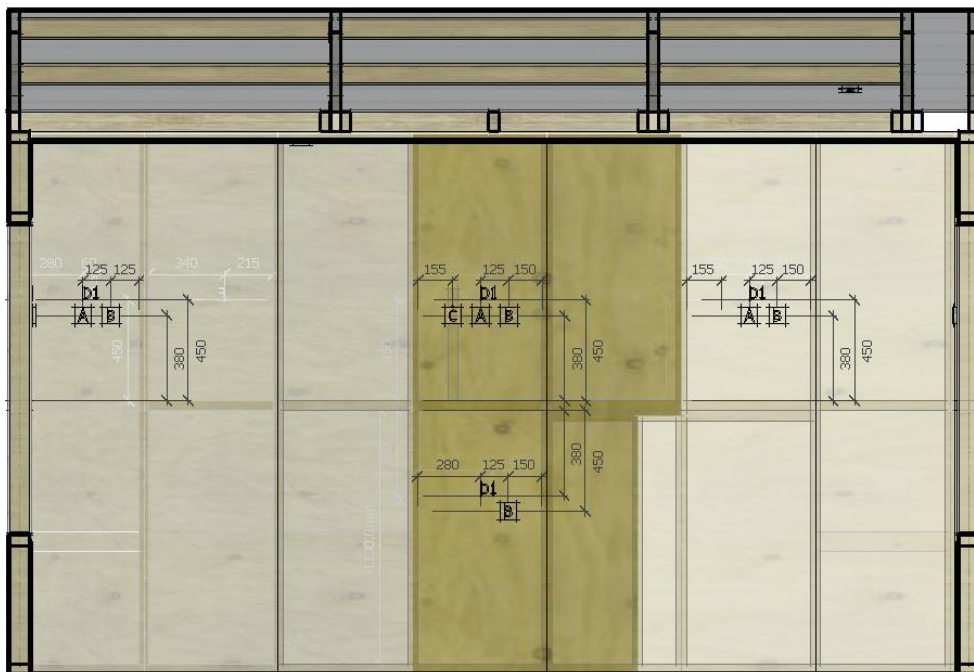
Experiment #2 general layout of thermocouples on non-rated long wall exposed lining (viewed from inside)
